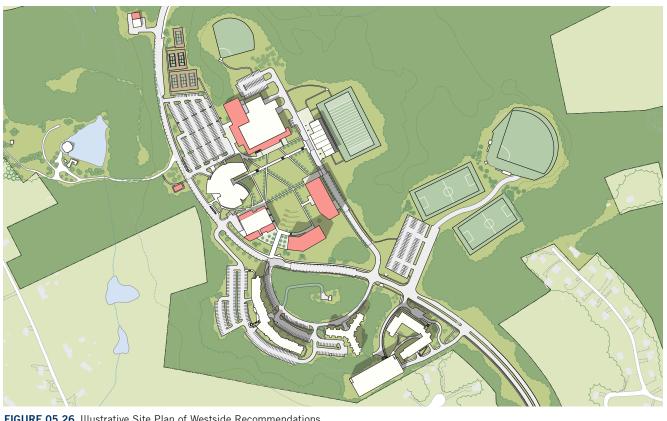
Illustrative Site Plan of Westside Recommendations
